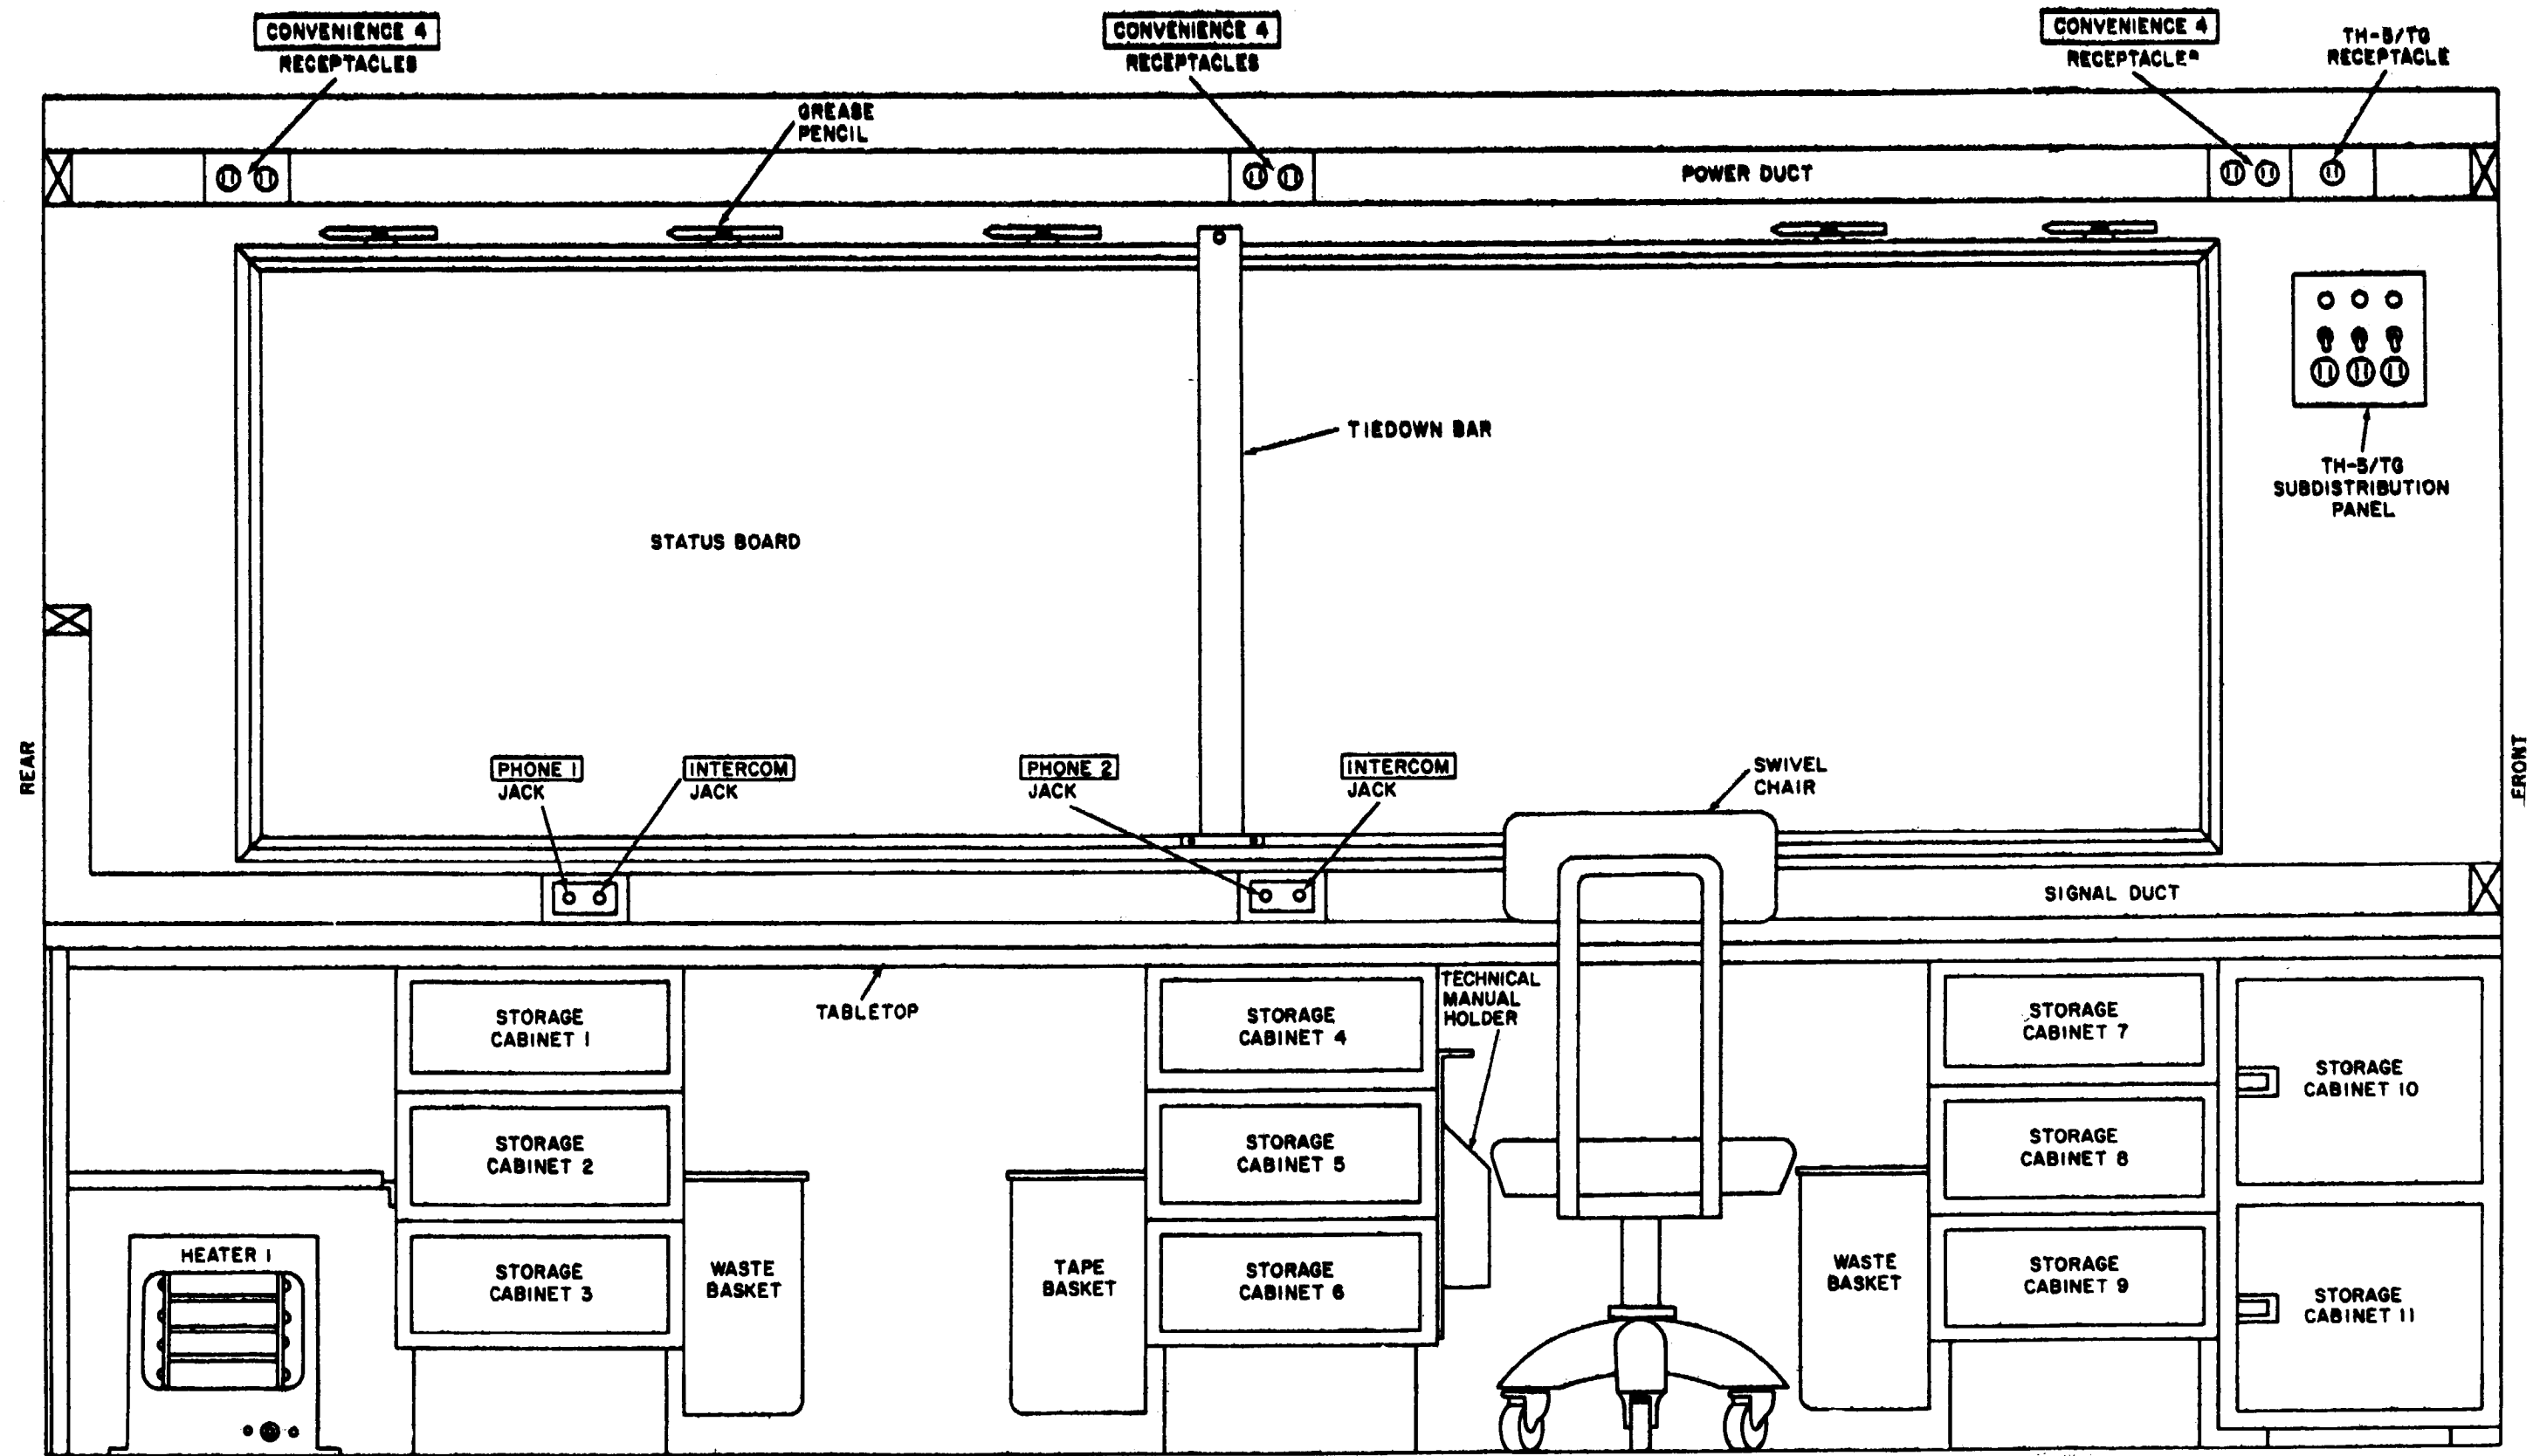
Operations Central AN/MBC-38, curbside wall, elevation drawing.
